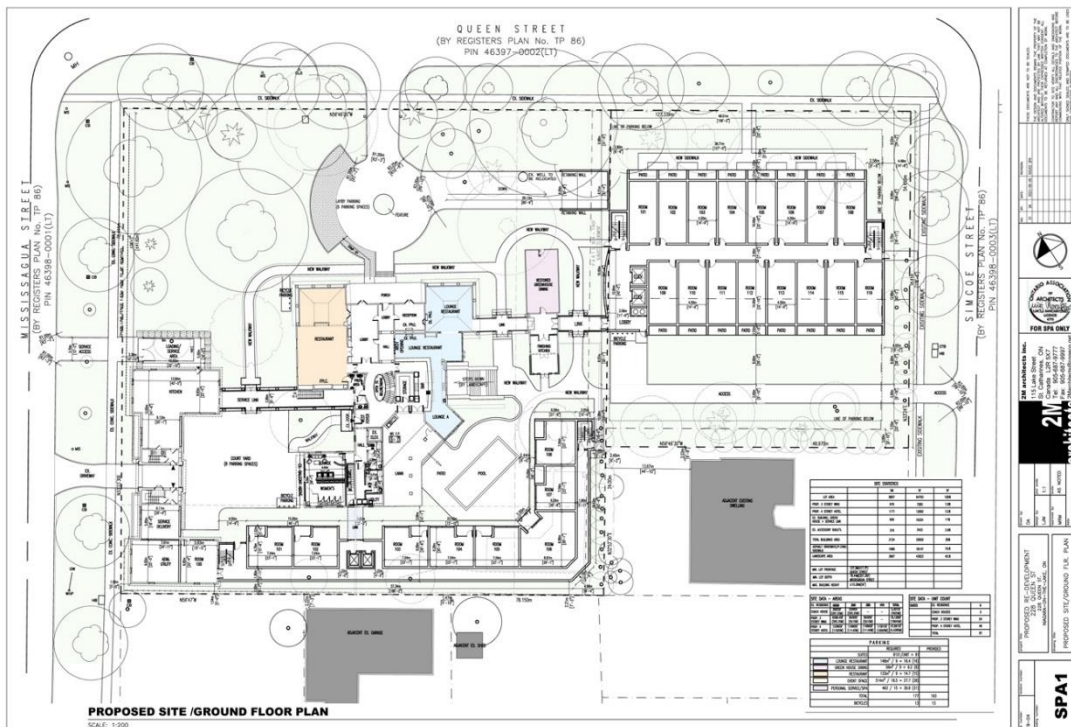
Sight Plan, 2M Architects (APPENDIX II)
